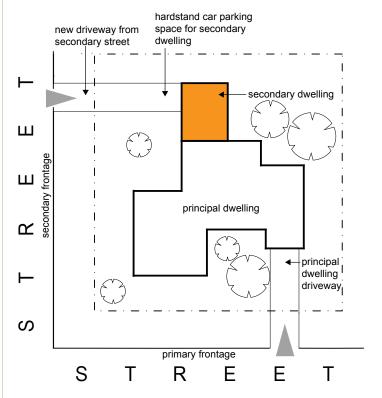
B.1-2: Separate vehicle access for secondary dwelling from a secondary street.
